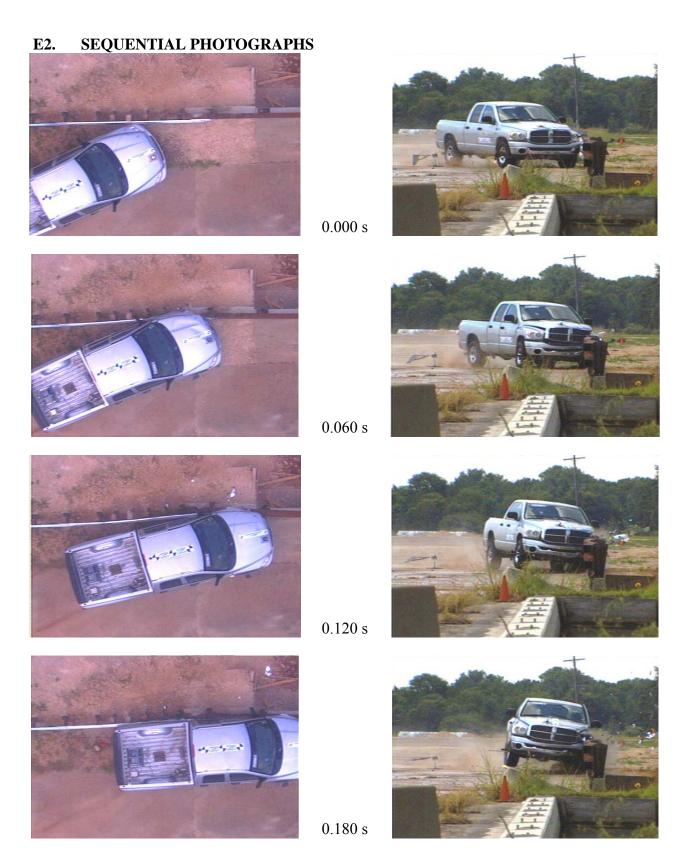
Sequential Photographs for Test No. 490022-8 (Overhead and Frontal Views).
